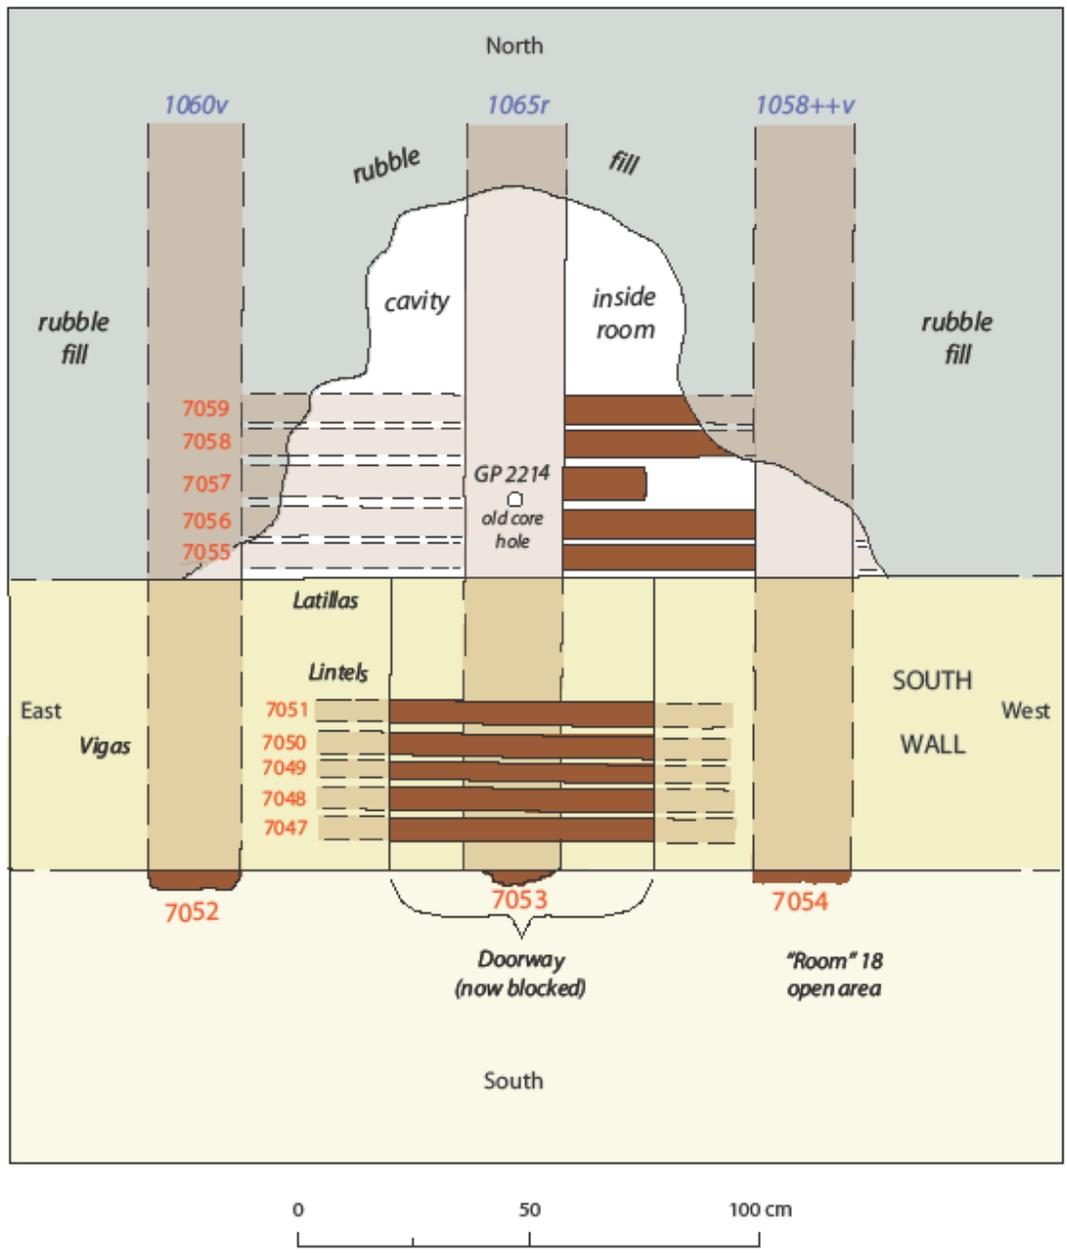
Talus Unit No. 1 Ceiling of the First Floor of Rooms 23 and 33. Note the perspective is as if one were lying on the floor with head to the north; thus, east and west seem opposite of what we expect for a plan view. (Map plan view by Tom Windes; digital copy by Clay Mathers.)
